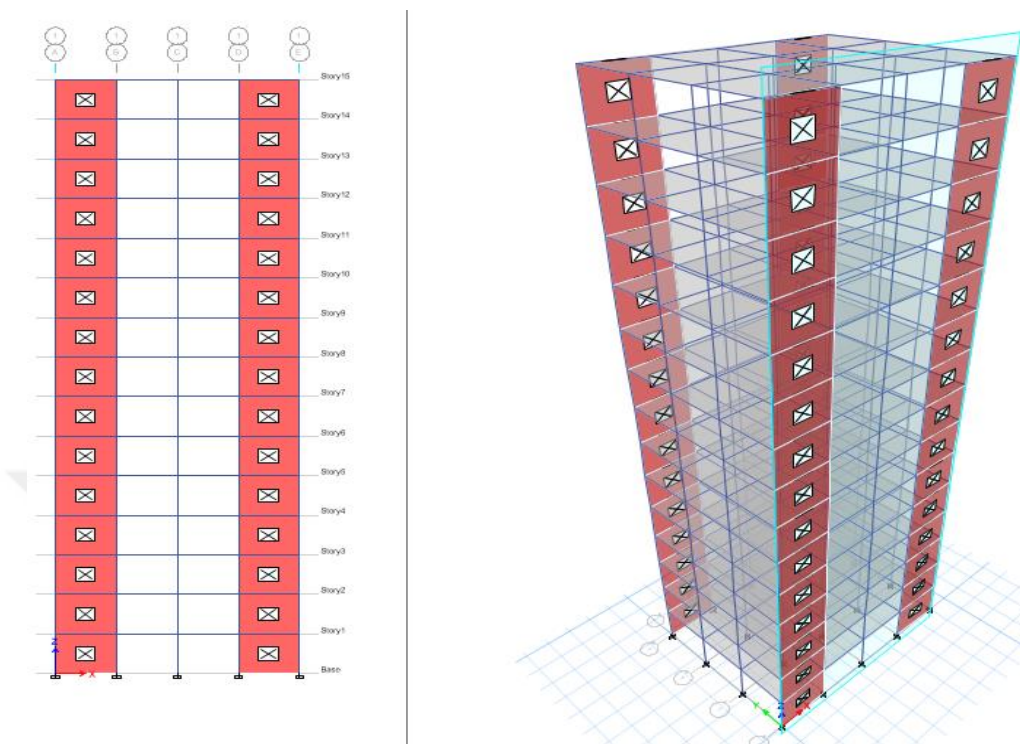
The 15-story building with concrete shear walls and with horizontal openings.
